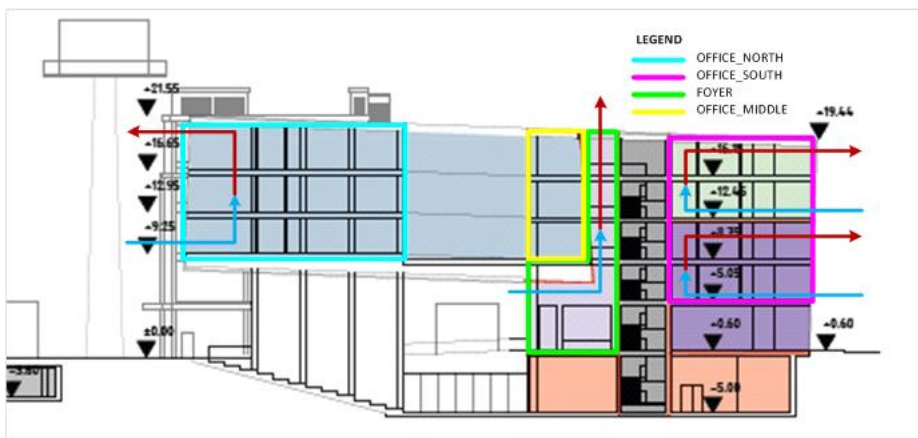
Cross section of the building fire regulation plan with fire compartments, model zones and a scheme of the selected stack-driven cross ventilation configurations for the considered zones.
